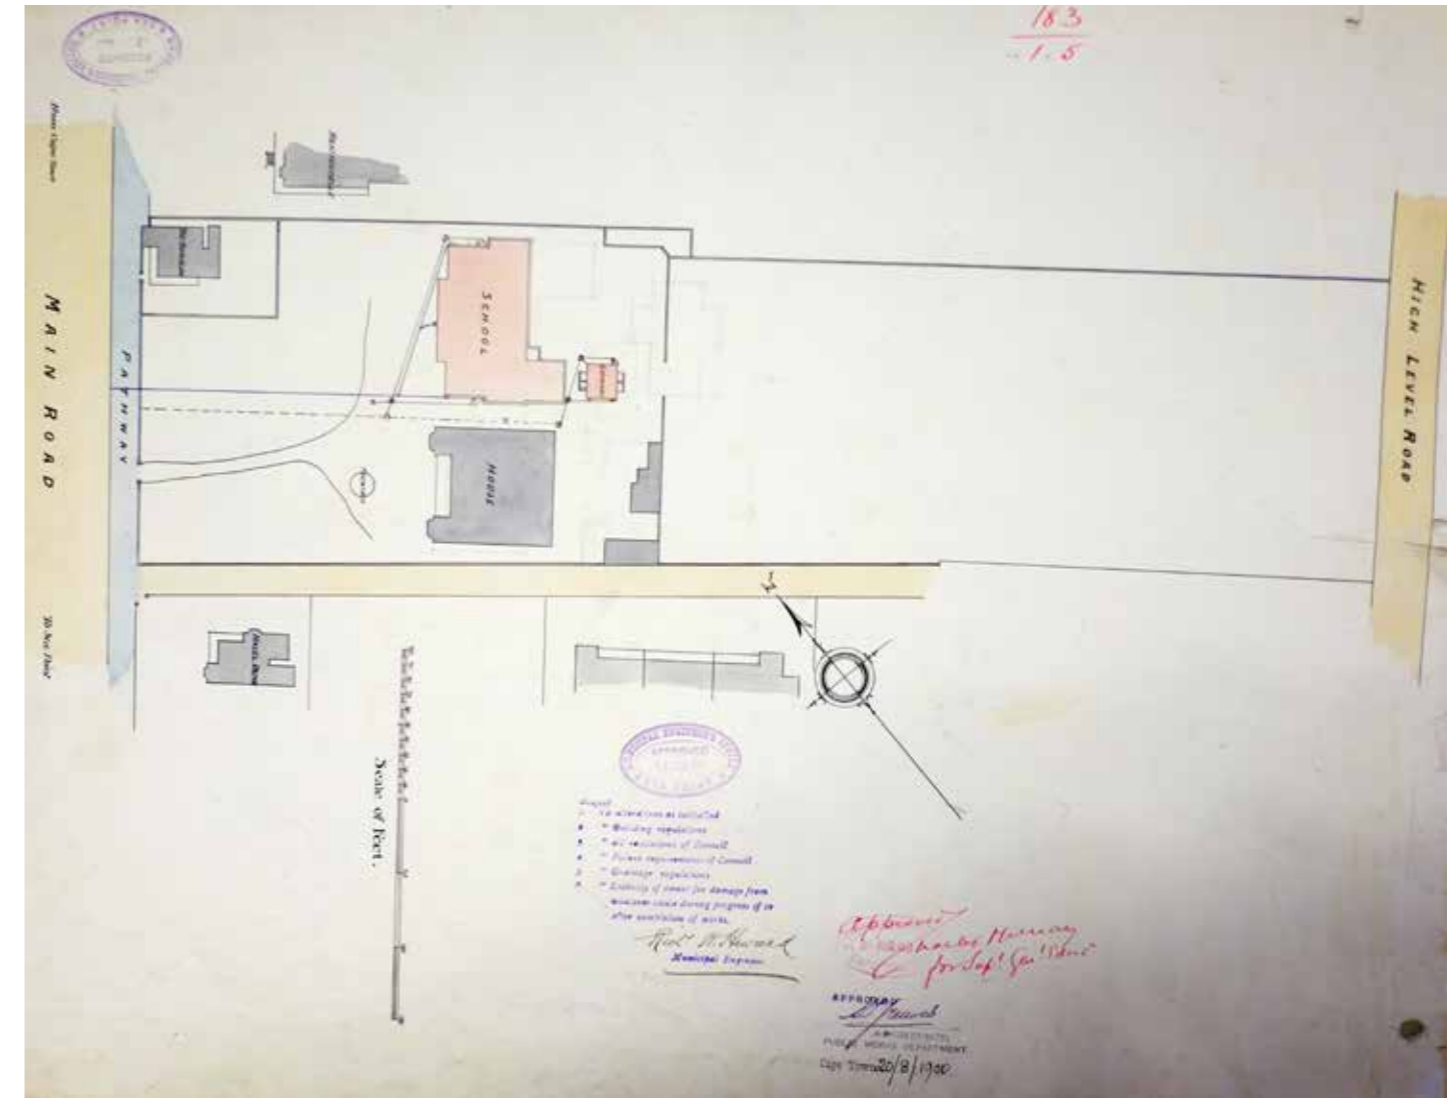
Ellerslie school site plan, Parker, 1900 (UCT Libraries, 2025)
